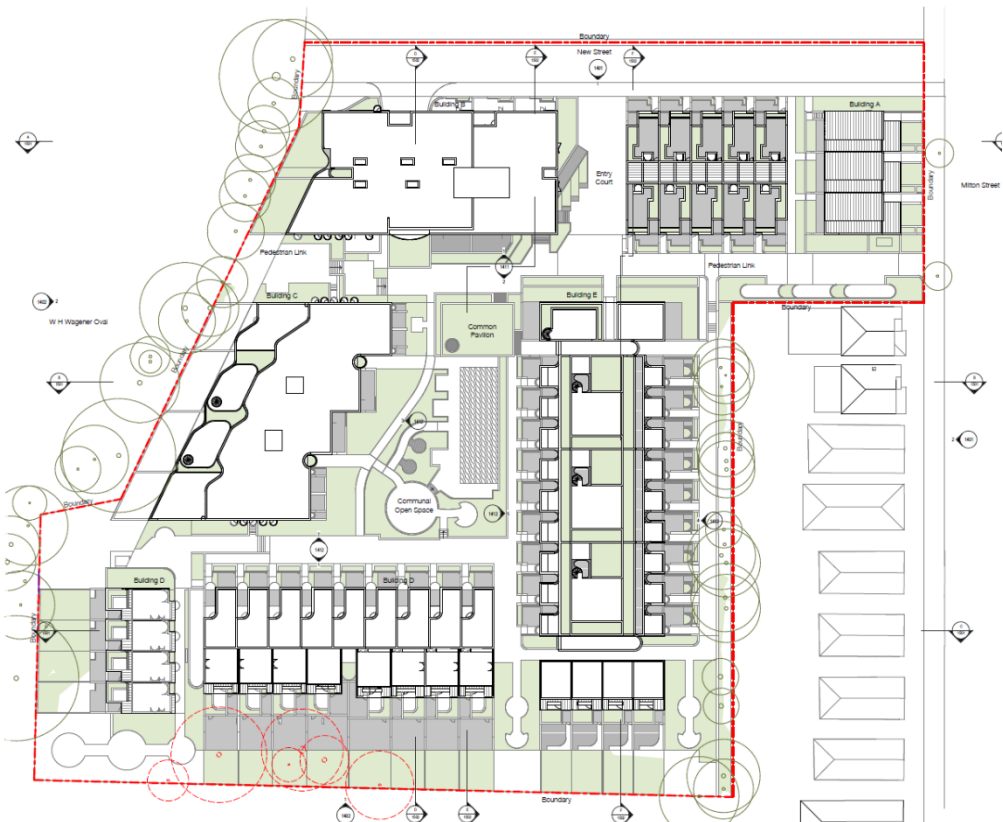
Proposed Overall Roof Level Plan. (Source: SJB Architects)
